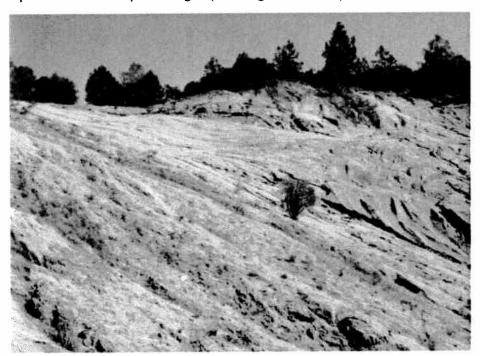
Central pit showing working face of recent extraction area and sediment retention structures at center (viewing east).
